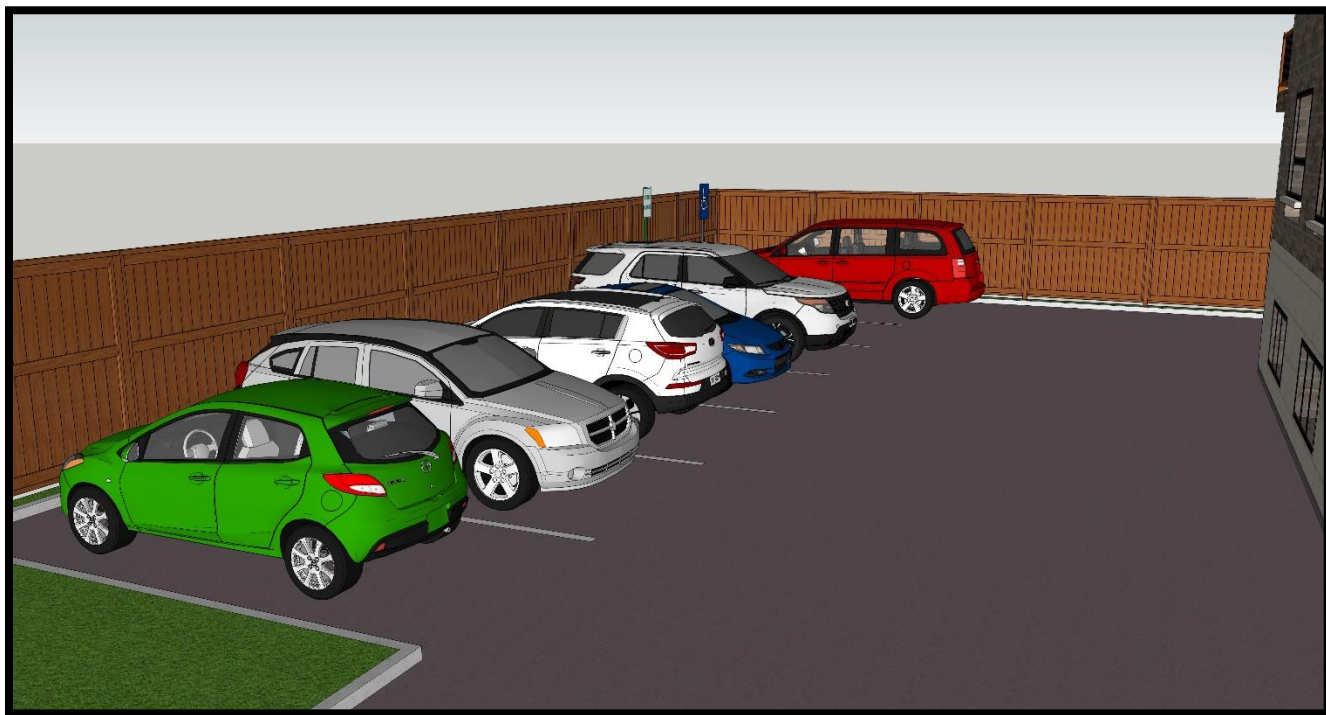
Perspective Drawings of Proposed Site showing Parking
